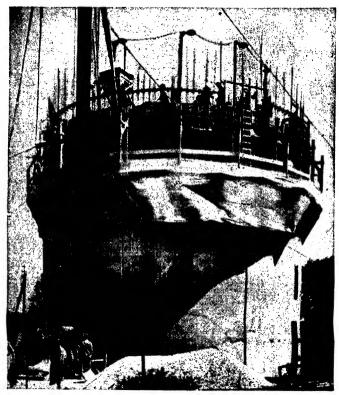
Reinforced-concrete water tank under construction using slip forms.
